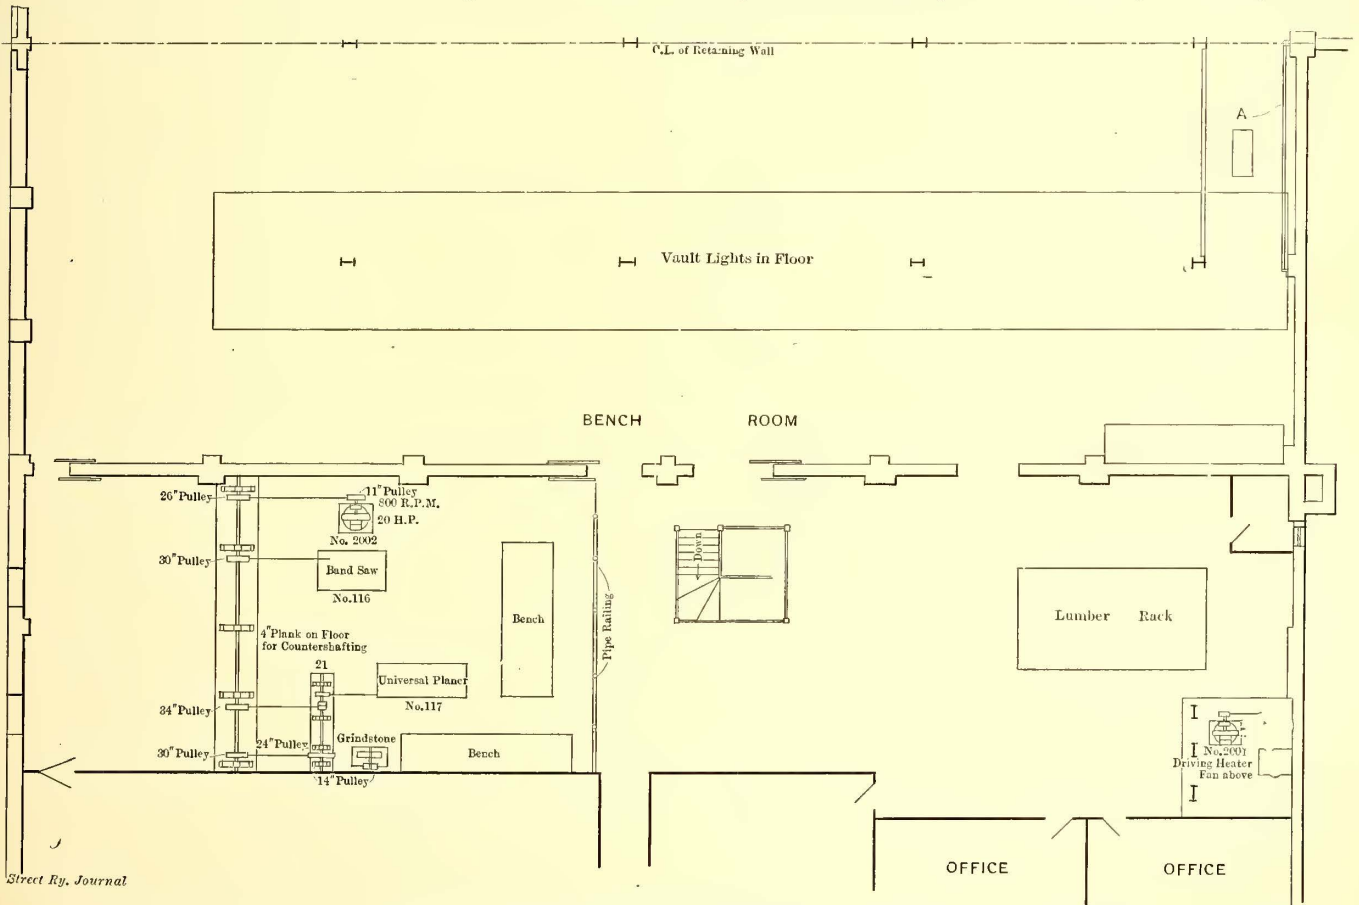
REBUILT PART PLAN OF SECOND FLOOR OF THE THIRTY-SIXTH STREET TERMINAL, SHOWING LOCATION OF BENCH AND MILL ROOMS, BLOWER, OFFICES, ETC.
